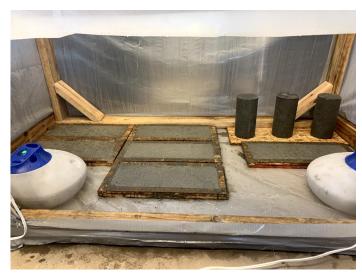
Ponderosa Concrete Canoe Team, 2020-2021, Mini Beams Curing in Curing Chamber[5]
